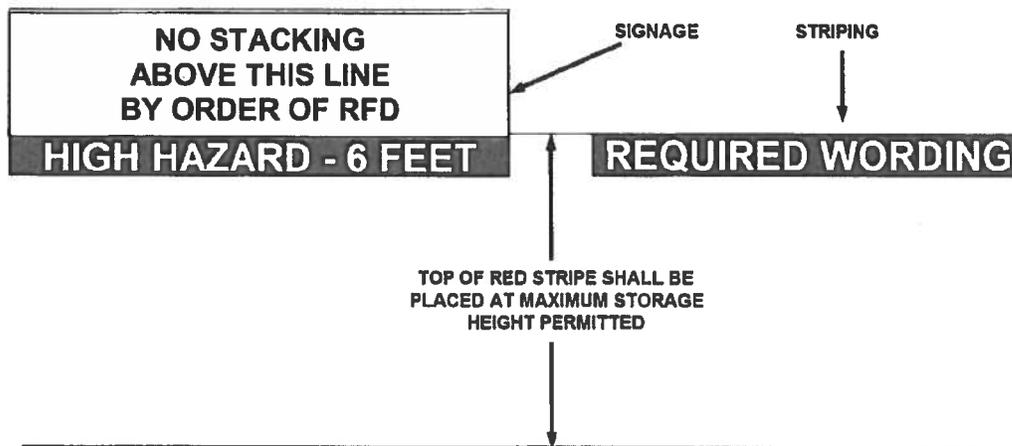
SIGNAGE AND STRIPING VERTICAL INSTALLATION EXAMPLE
